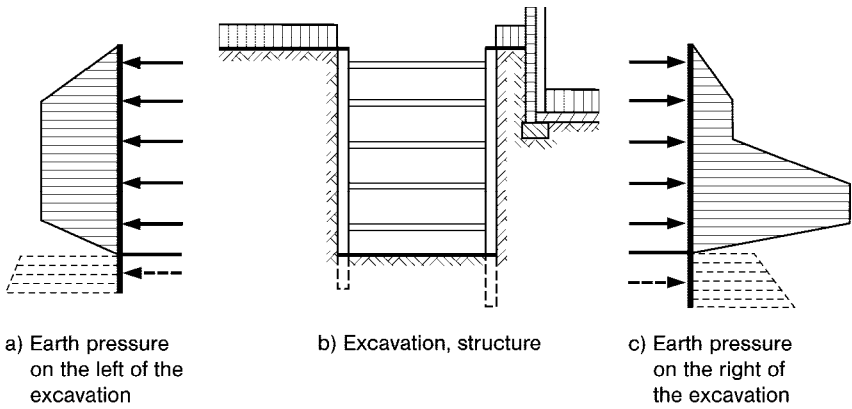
Excavation with horizontal bracing and one-sided loading from a structure
